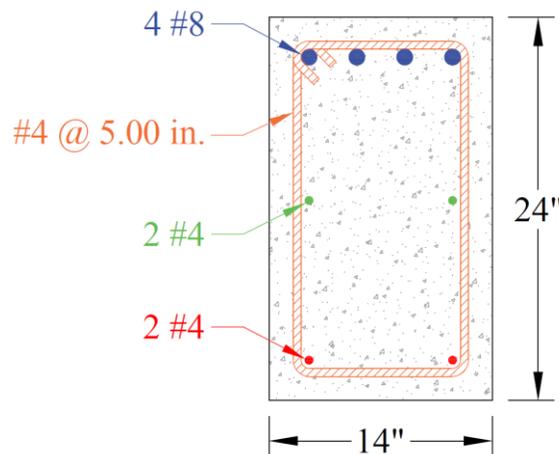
Reinforced Concrete Cantilever Beam Cross Section
